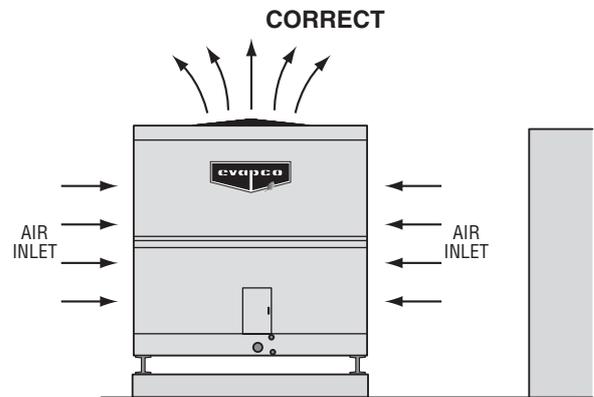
Installation Elevated so Top of Unit Is Higher than Top of Wall
